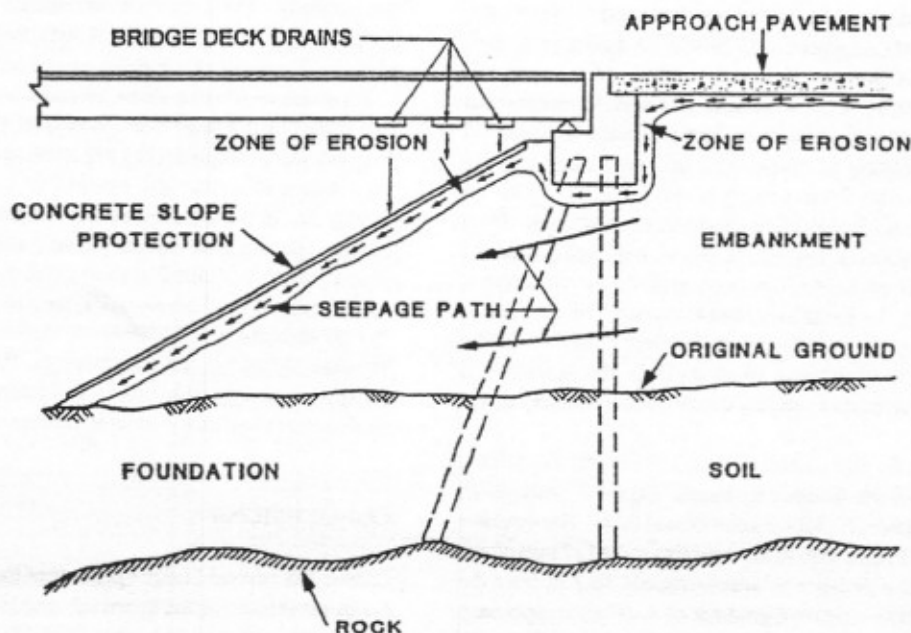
Schematic of embankment erosion and seepage leading to loss of support beneath abutment and slope facing [modified from (24)].
